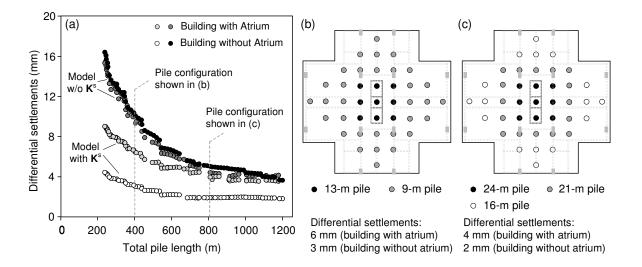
Pareto frontiers and optimized pile configurations for buildings with and without atrium floor
